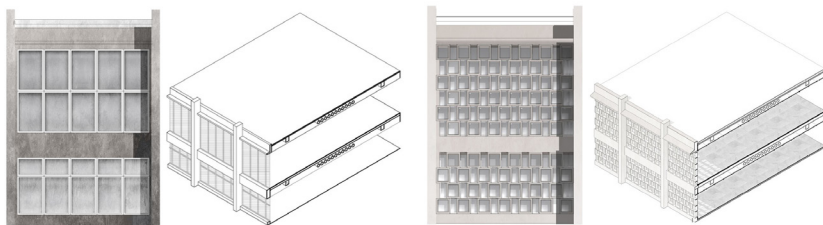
Restoration of the foyer's *brise-soleil* façade. Left: existing condition (elevation and axonometric). Right: proposed restoration (elevation and axonometric)
